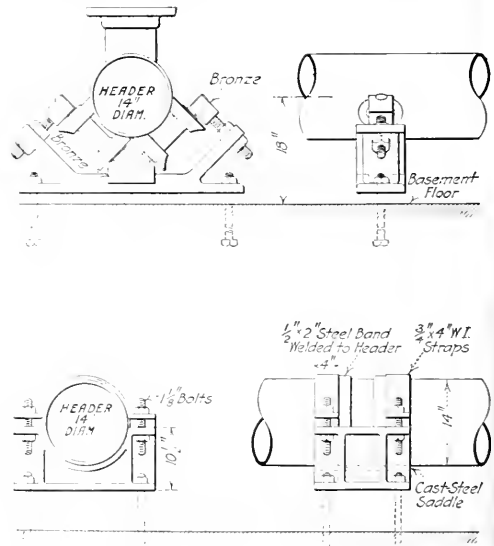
ROLLER SUPPORT AND ANCHOR BLOCKS FOR MAIN STEAM HEADER
